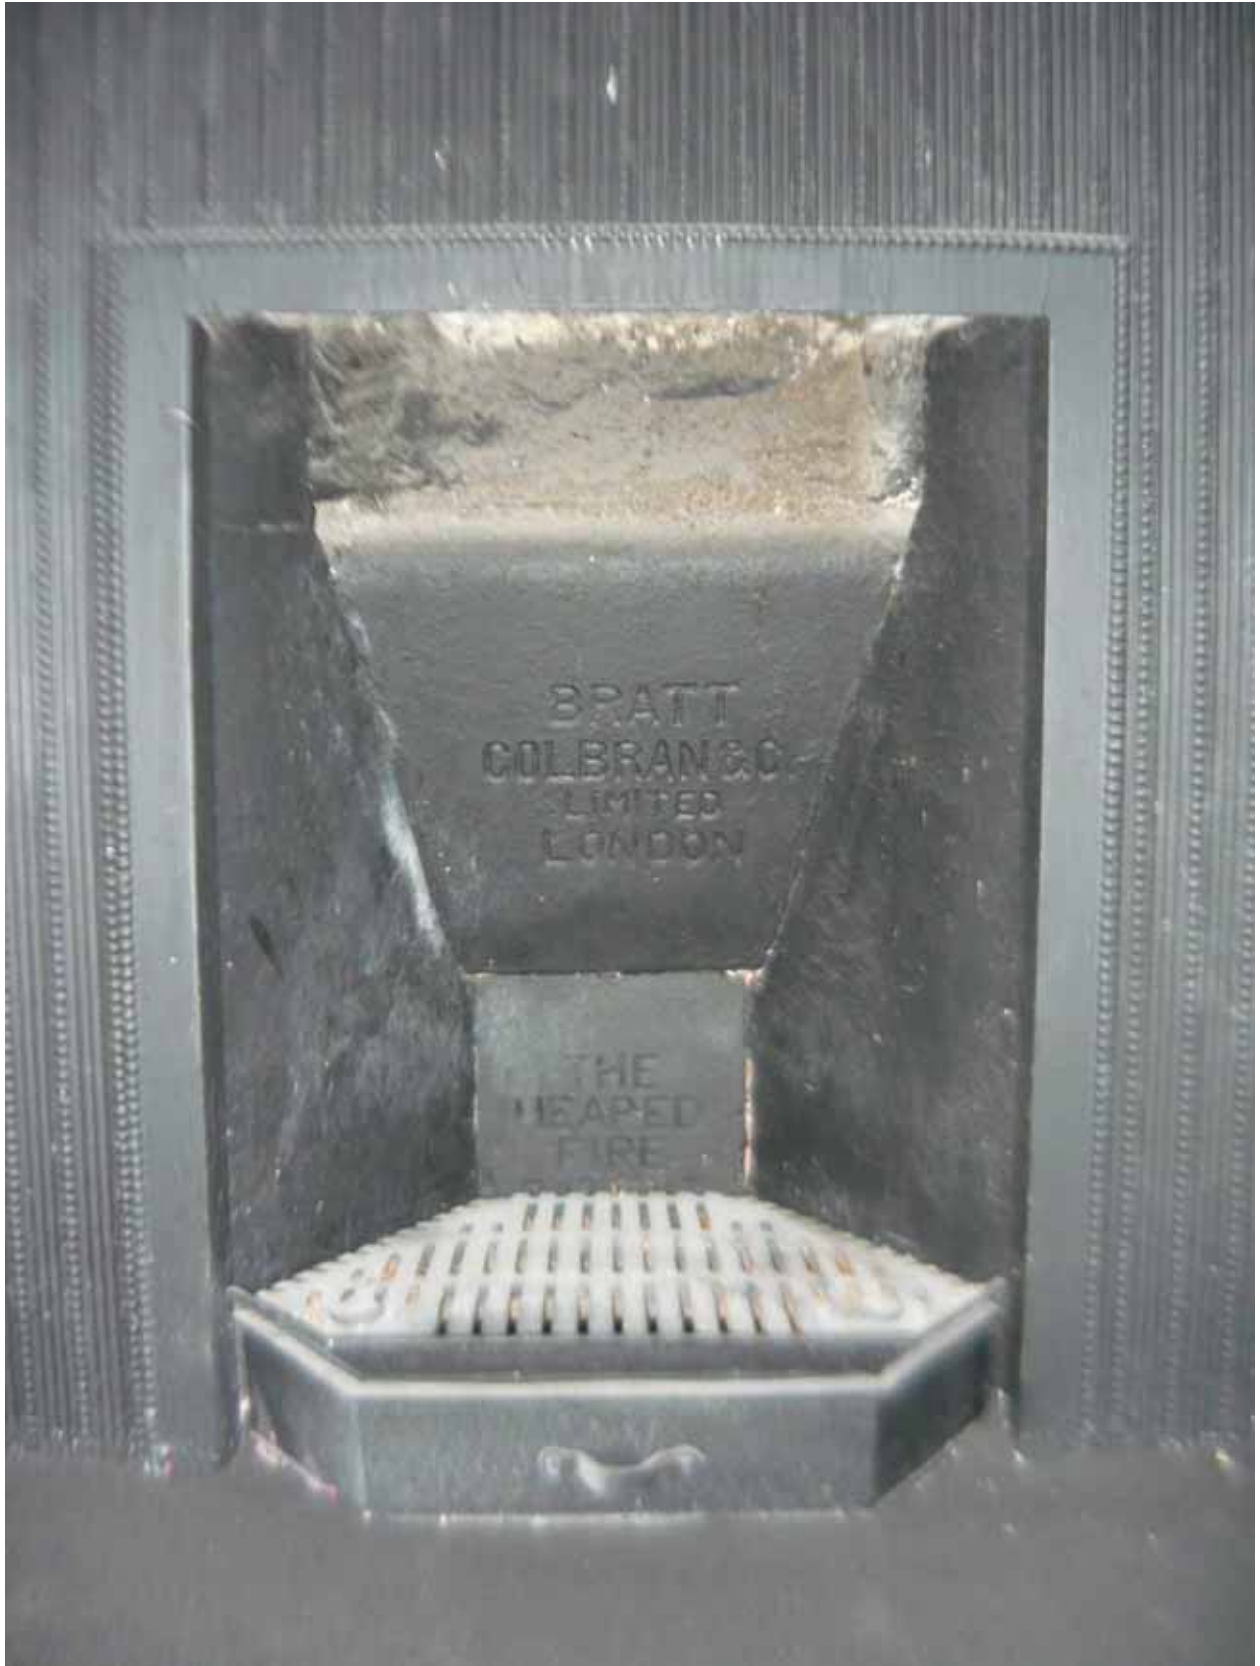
Close up of the fireplace in the south wall of Room G03, looking south (EAF10 BHD1 (49))
